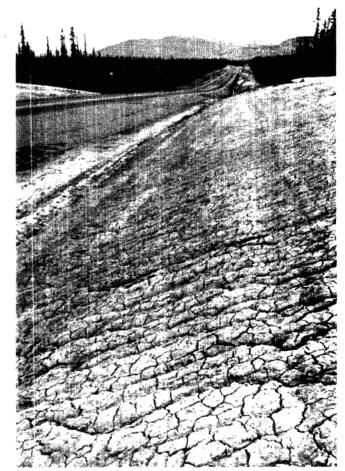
Ditch in silty soil lacks rip-rap. Approach to bridge at Nisutlin Bay inlet, Alaska Highway, km 1291. Reconstructed section.
